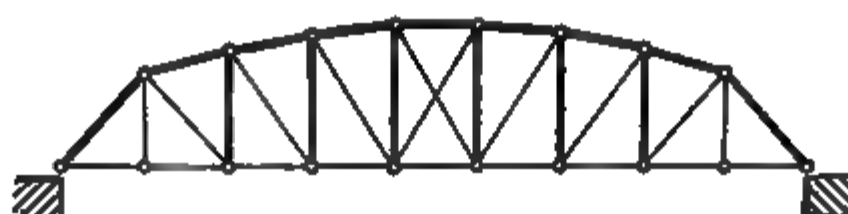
INCLINED PRATT OR CAMELS-BACK TRUSS.
